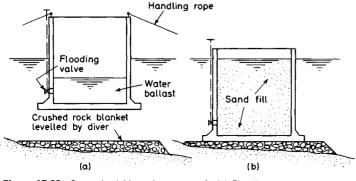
Stages in sinking a buoyancy raft. (a) Flooding valve opened to admit water ballast; (b)caisson sunk in final position
